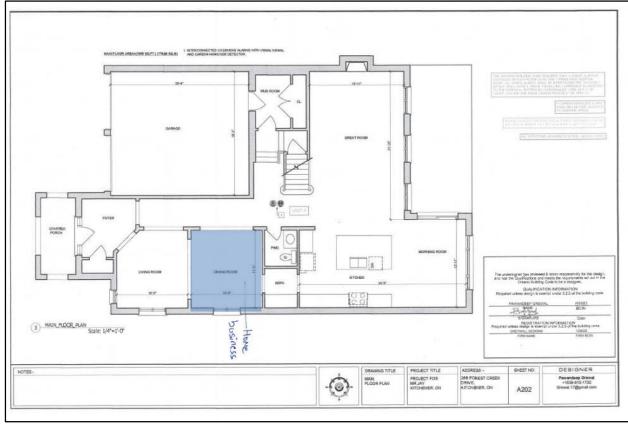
The main floor plan of the principal dwelling house showing the location of the proposed home occupation
